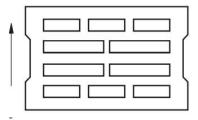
Lightweight concrete masonry units — Geometry 1,3/x
